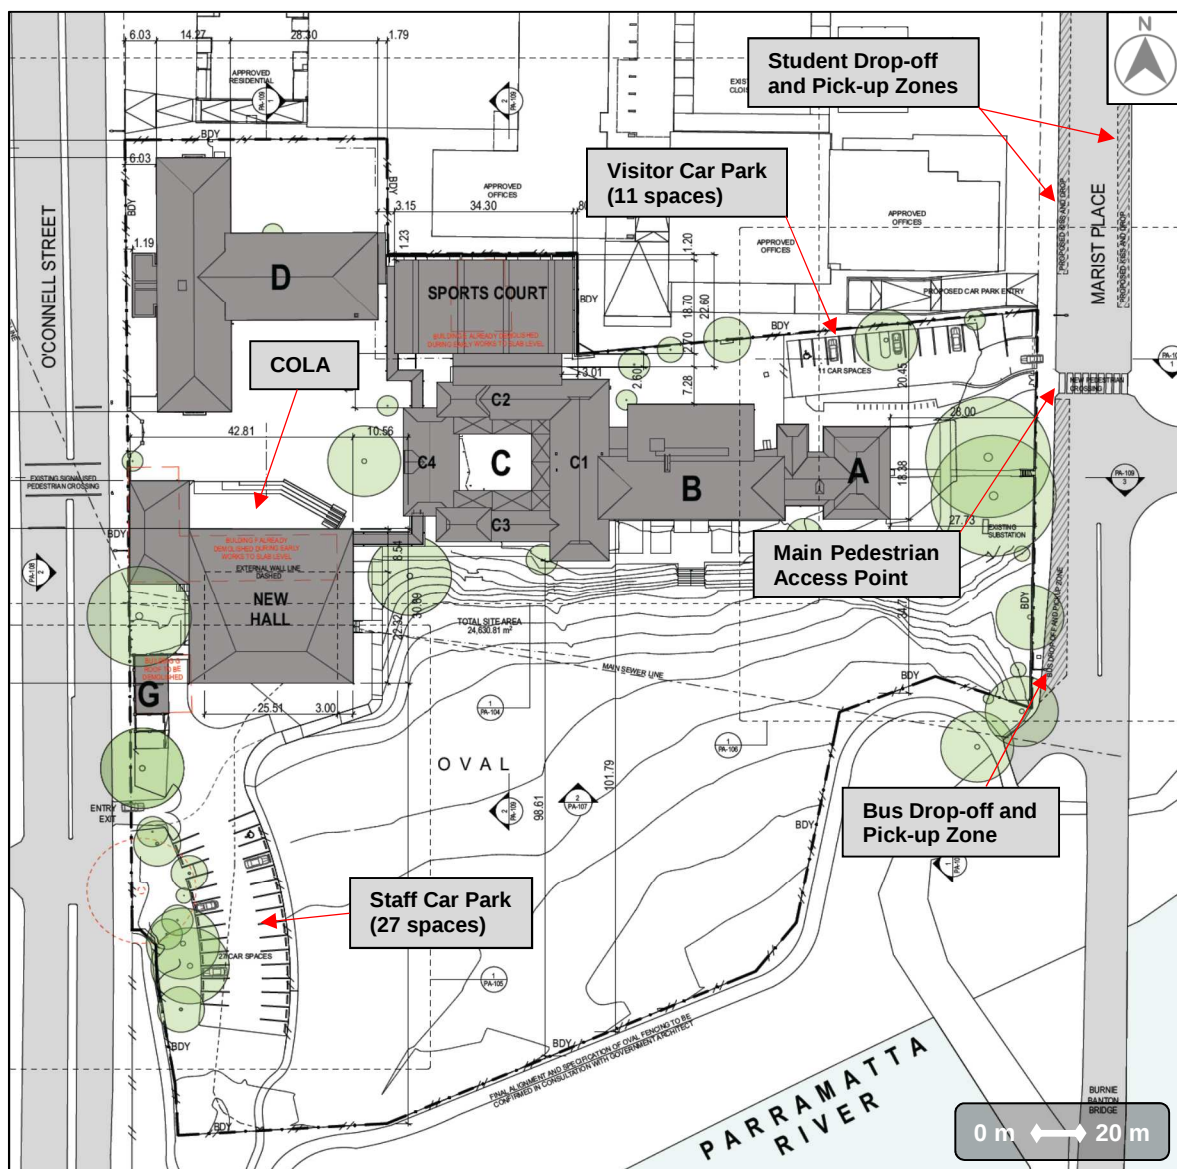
Proposed site layout – O'Connell Street and Marist Place, Parramatta (source: EIS)
